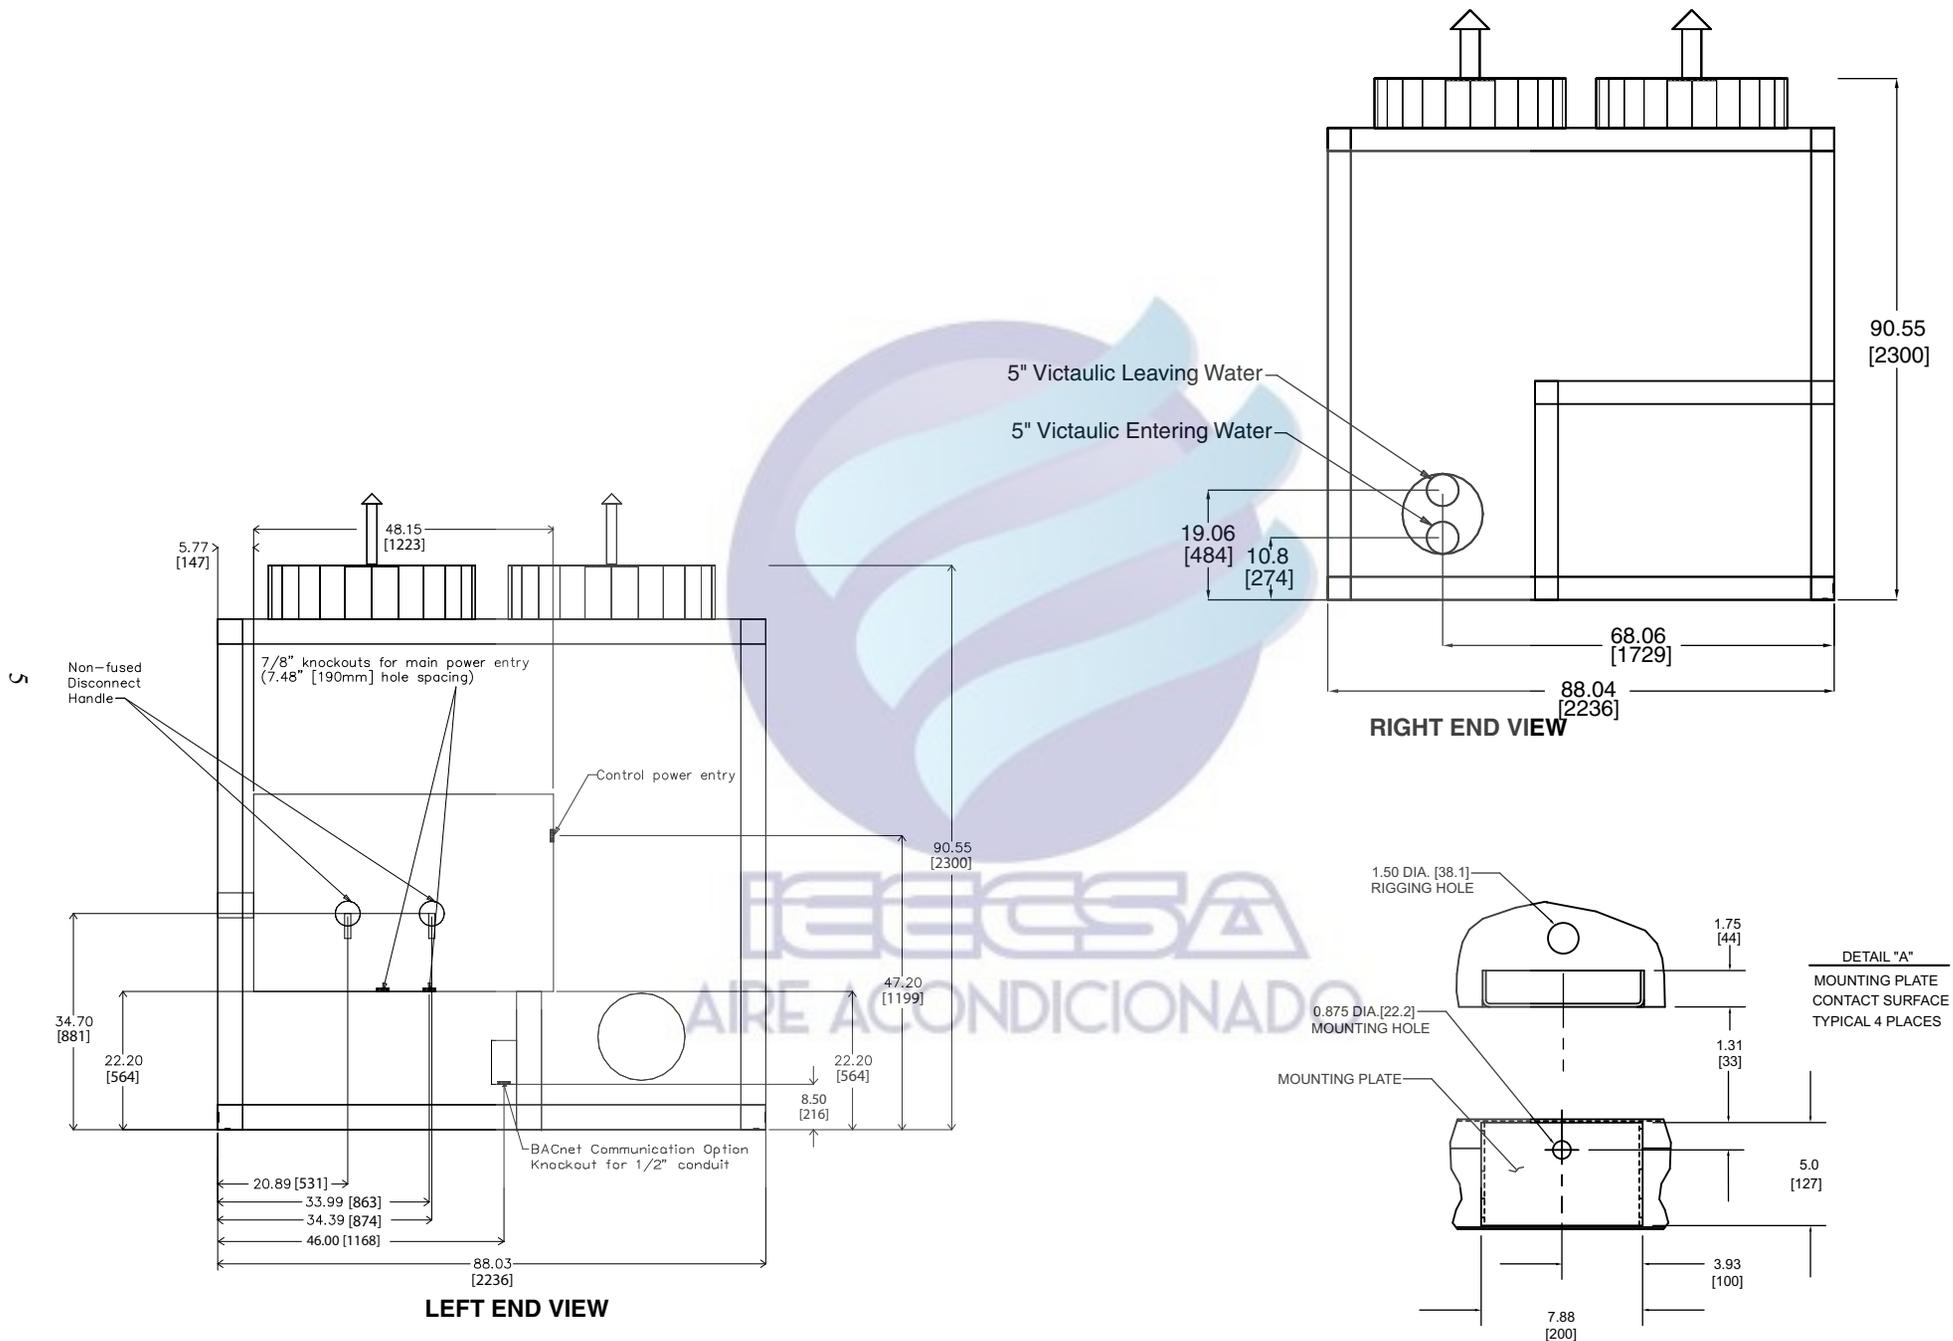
30XA080 Air-Cooled Liquid Chiller Dimensions (cont)
